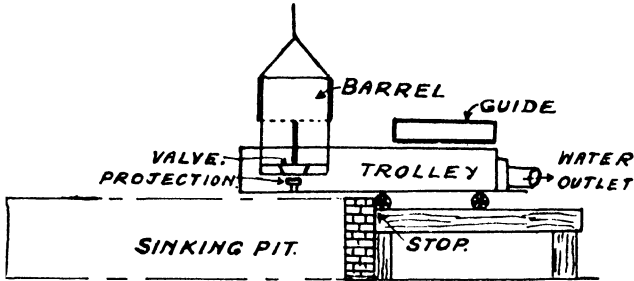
Trolley Arrangement to empty Water-Barrel.
